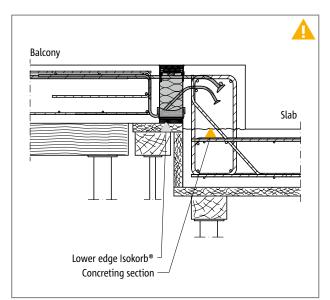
Schöck Isokorb® T type K-U: Cast-in-place concrete balcony with height offset downwards
